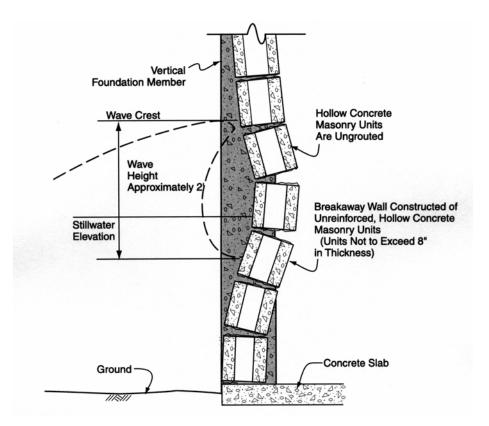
Compressed air trapped between a breaking wave and a vertical wall generates extreme horizontal pressure, often leading to structural failure. Reprinted with permission from the FEMA Technical Bulletin 9-99 (FEMA, 1999).
